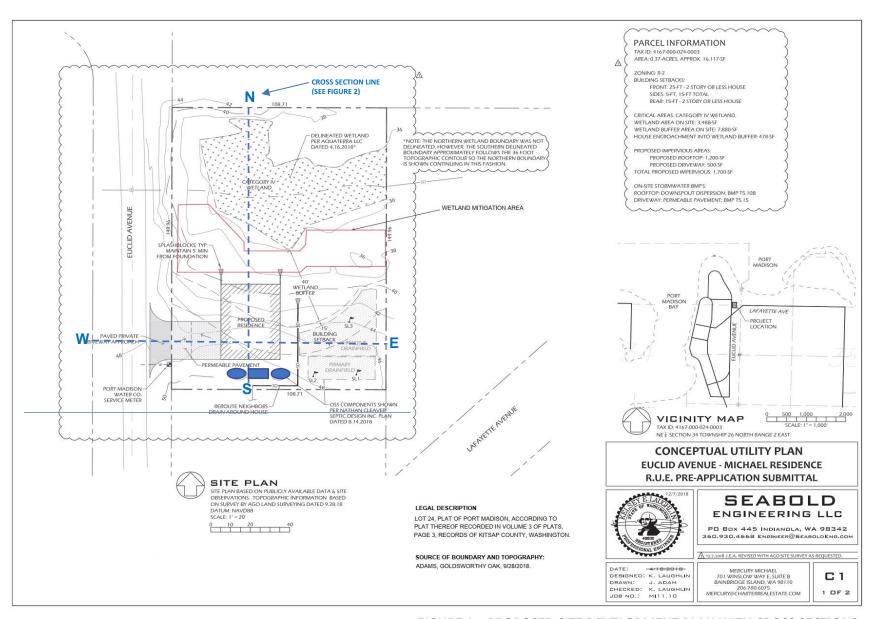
PROPOSED SITE DEVELOPMENT PLAN WITH CROSS SECTIONS
